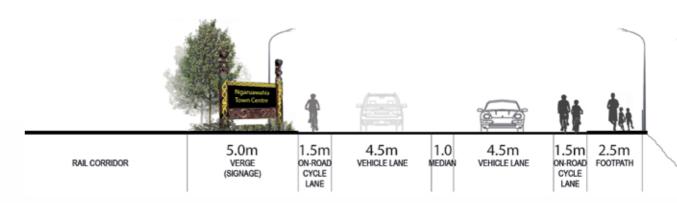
Indicative cross section - Great South Road gateway to Ngaruawahia town centre
